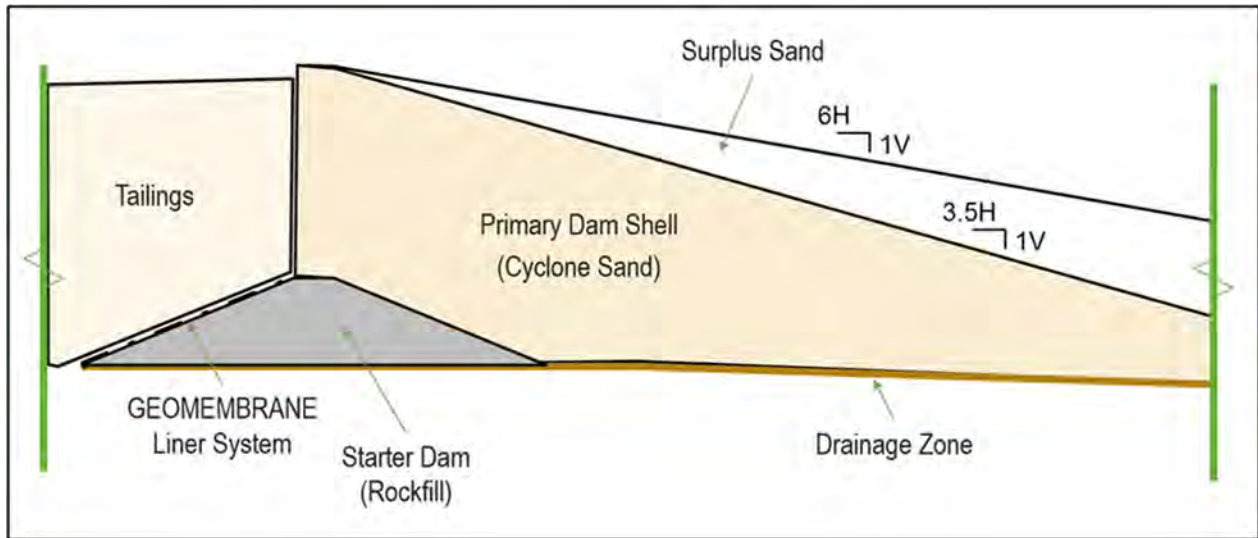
Tailings Management Facility Main Dam – Conceptual Section (KP, 2021)
